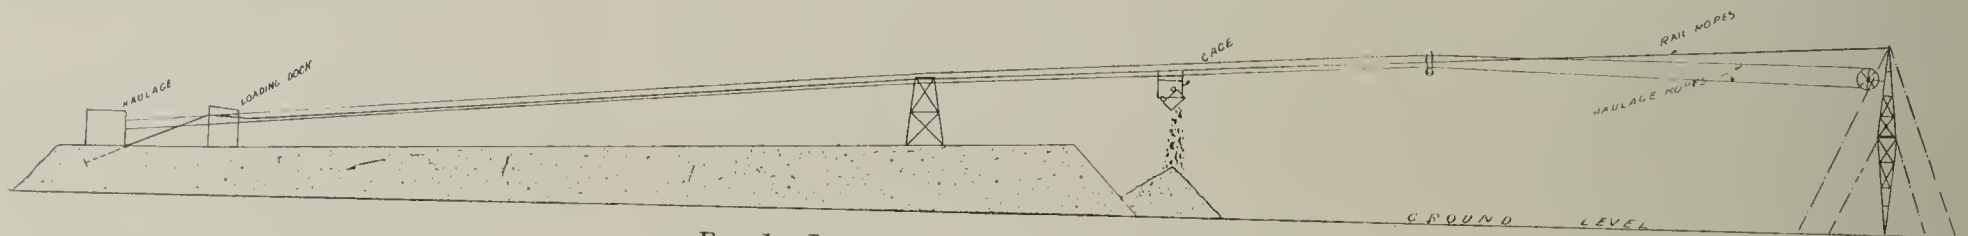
LONGITUDINAL SECTION OF ROPEWAY.
